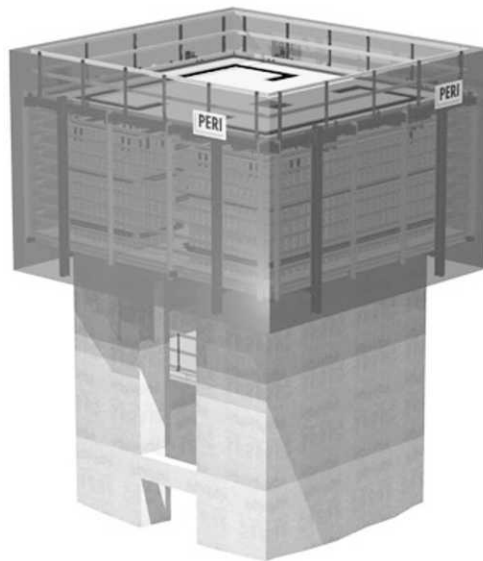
ACS P Formwork System (Courtesy PERI).
